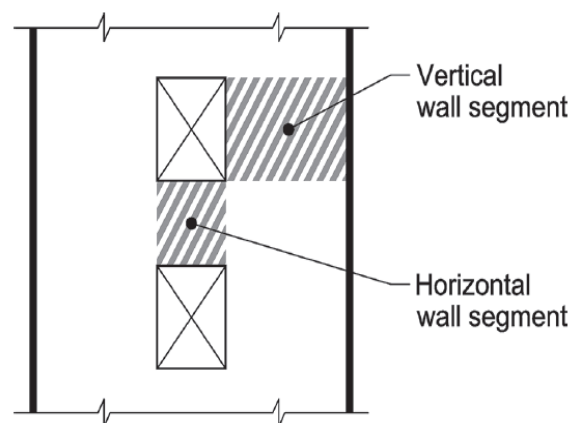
WALL WITH AN OPENING (ACI 318-14).
